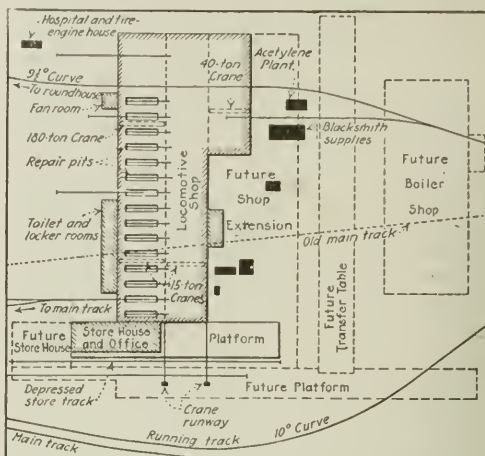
NEW SHOP LAYOUT AND FUTURE EXTENSIONS
